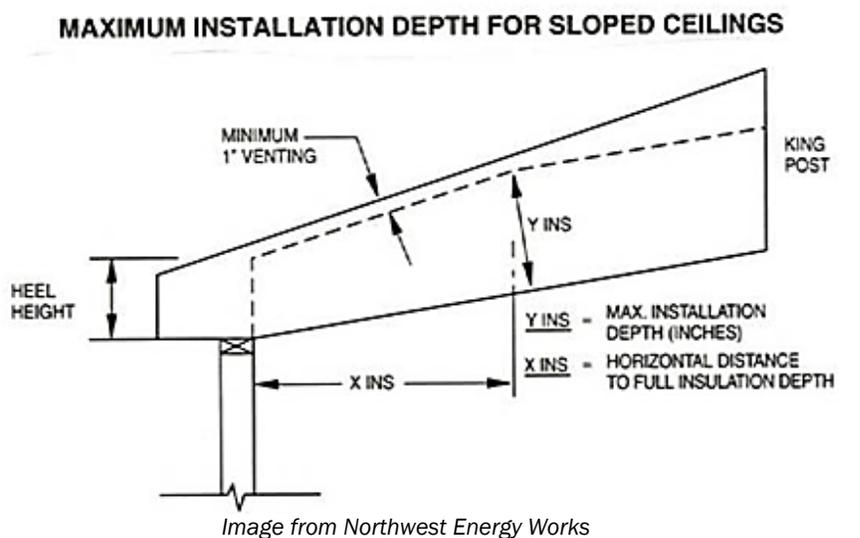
Typical factory insulation installation strategy (1-inch minimum air space between roof deck and insulation required for low eave venting)
